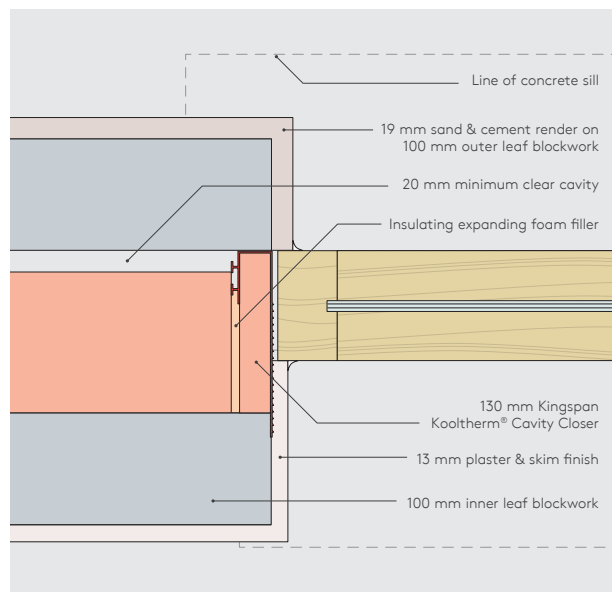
Typical Kingspan Kooltherm® K8 Plus Jamb Detail
